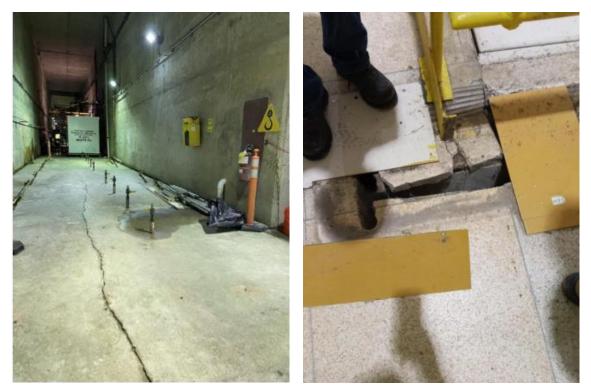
Example of concrete repairs required at the powerhouse (floor crack) and generator floor
